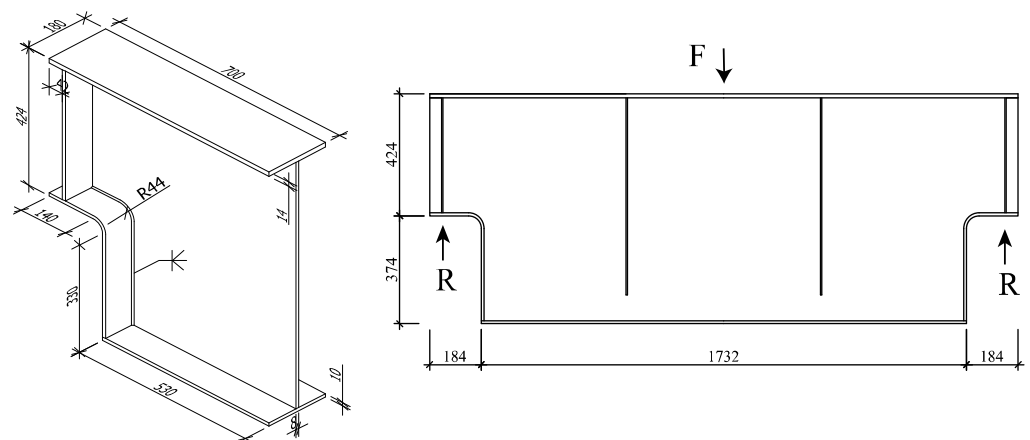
Dimensions of the variable-section support specimens with R-plates.
